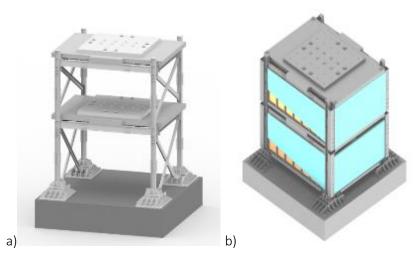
FUTURE mock-up; overall layout without (a) and with cladding (b)
